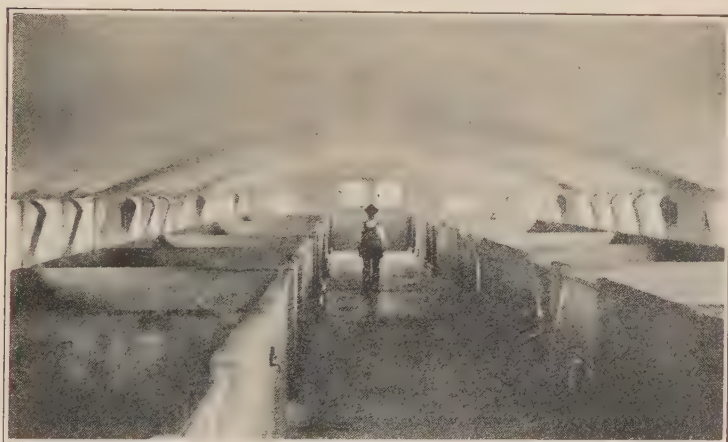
INTERIOR OF CONCRETE PIGGERY AT WHITE PLAINS, N. Y. NO WOOD USED IN THIS BUILDING EXCEPT FOR THE DOORS AND SASH.
